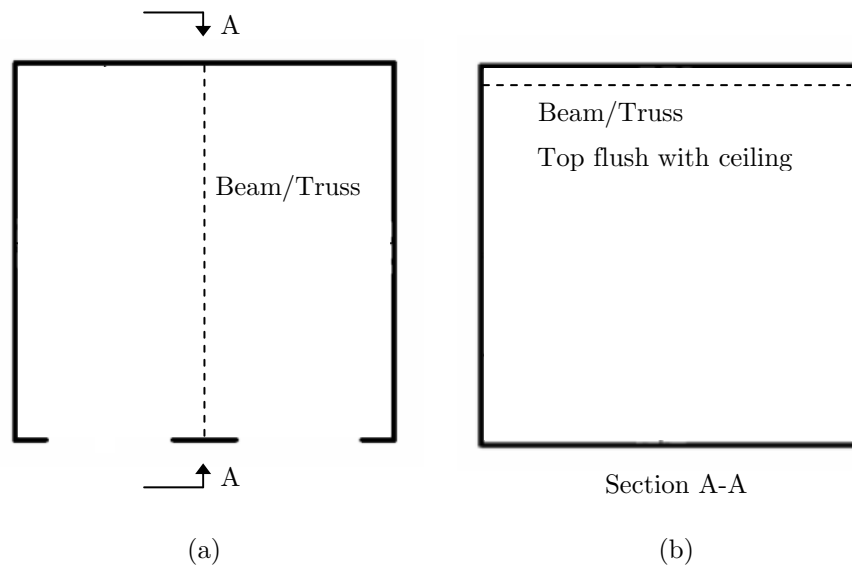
Location of structural member within the Cardington compartment (a) Plan view (b) Elevation
